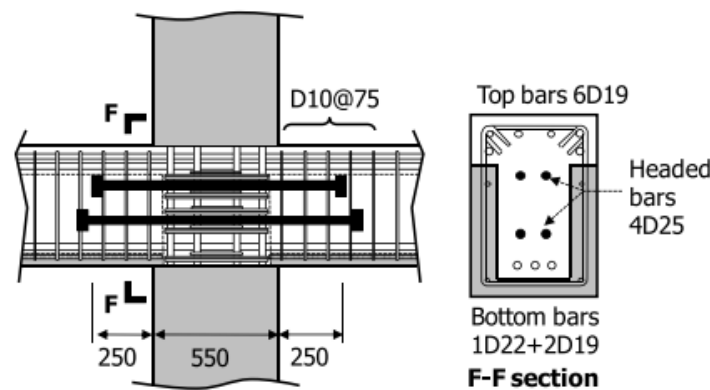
Construction the plastic hinge in a precast beam (Sucuoğlu, 1995)
